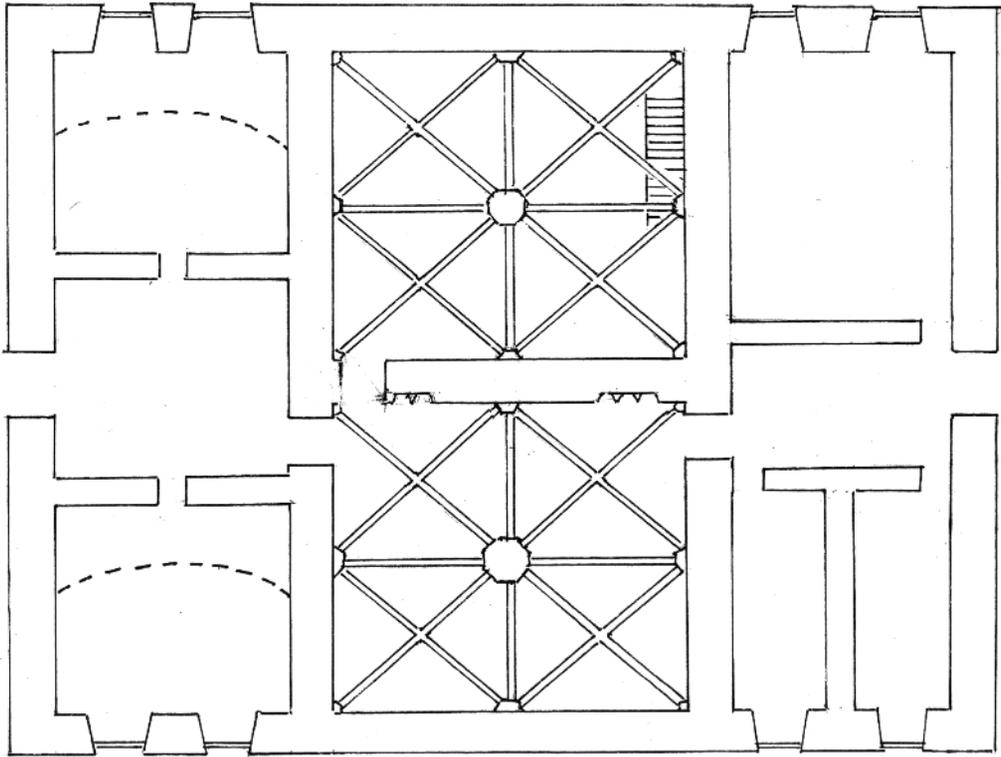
Chevening: plan of basement. *Andor Gomme*.
